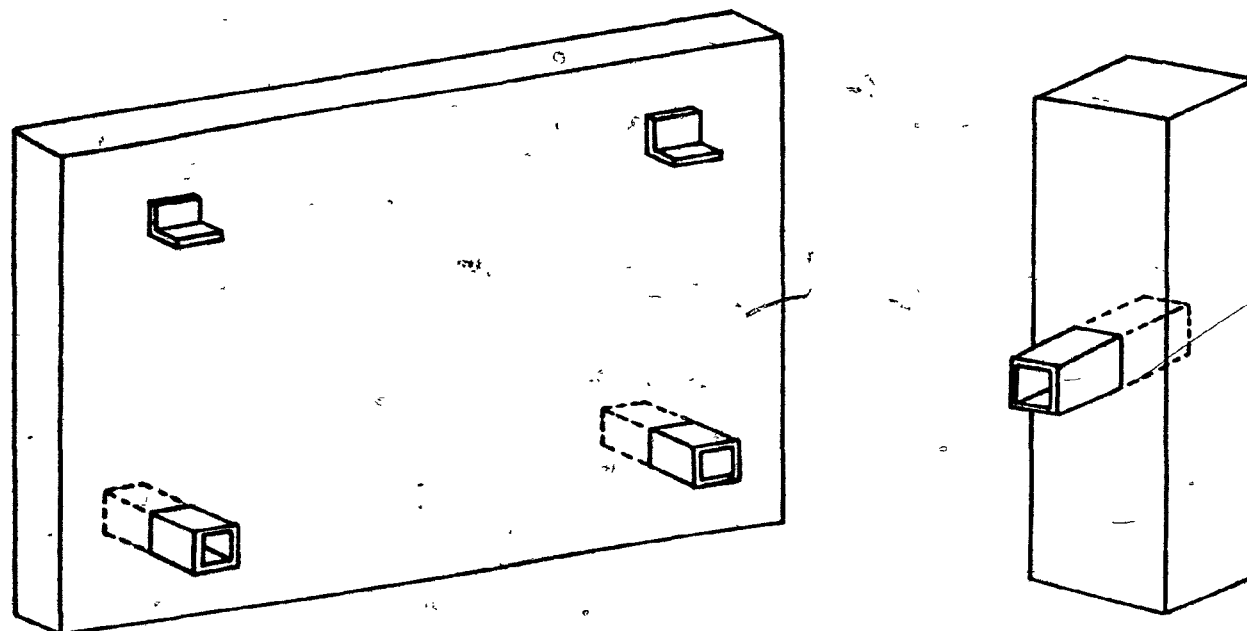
Typical wall panel and beam to column connections incorporating embedded structural steel members
